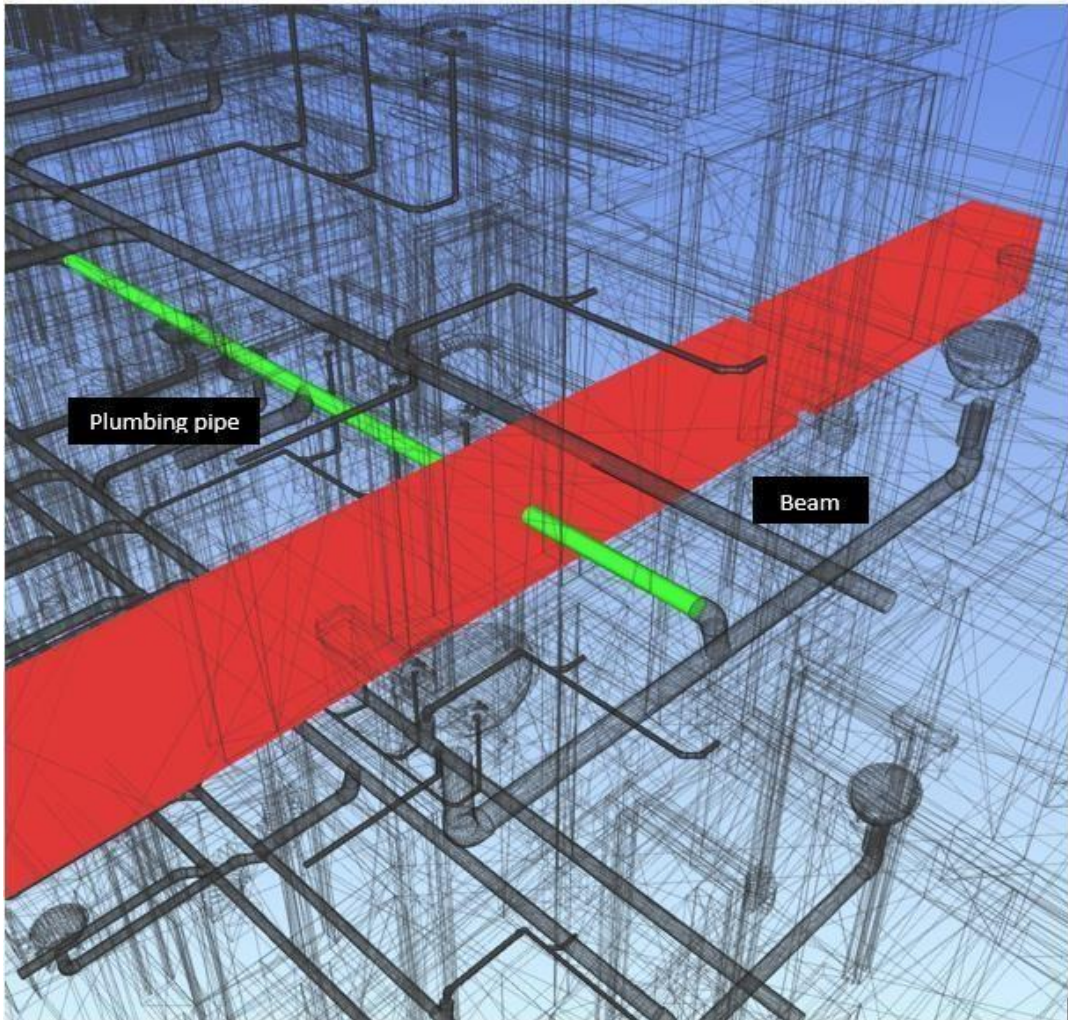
Clash between Beam and Plumbing Pipe on Second Floor.
